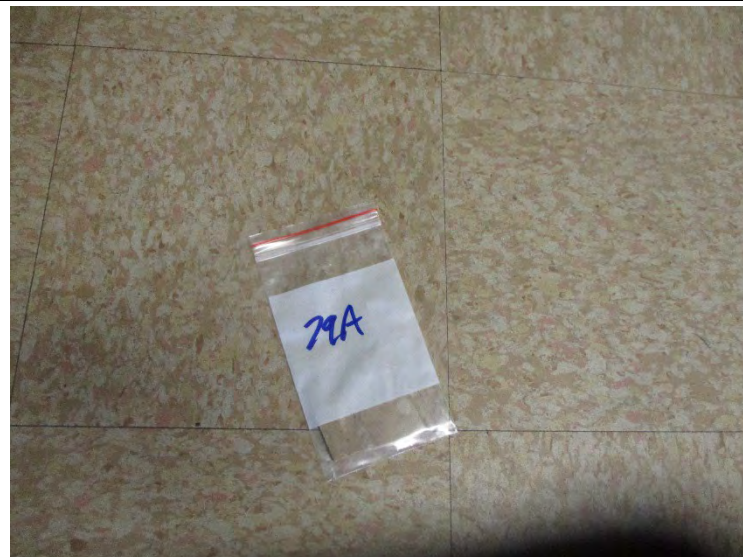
A view of asbestos-containing 9"x9" floor tile in classroom 205
